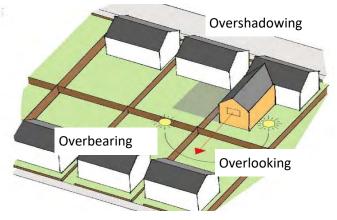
The extension would overlook and overshadow adjacent properties and would be overbearing to the adjoining rear gardens – this is not acceptable
